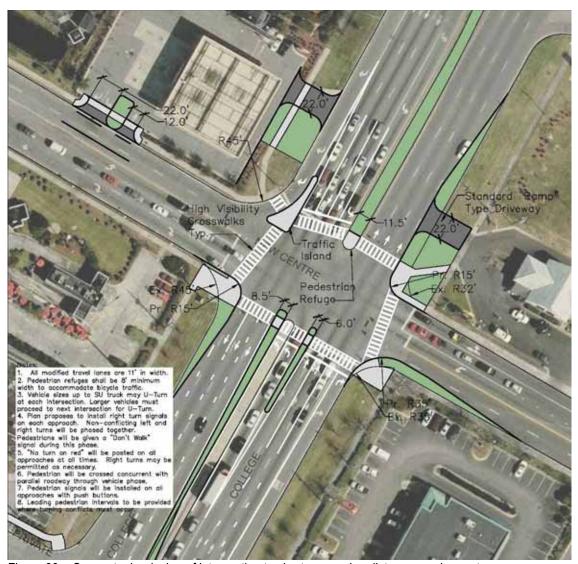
Conceptual redesign of intersection to shorten crossing distances and recapture unnecessary roadway space to provide pedestrian accommodations.
